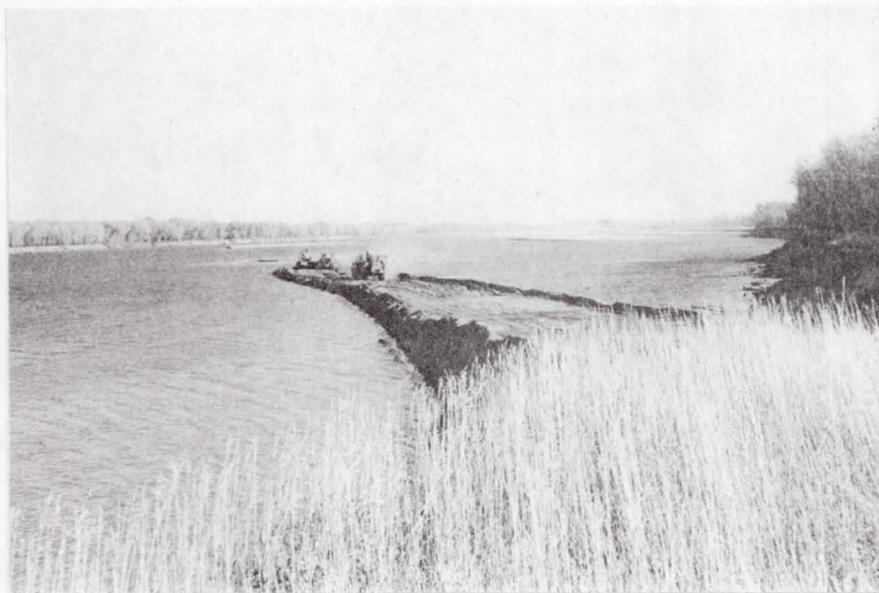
Construction View of Earth Core Dike 1345.5 loading downstream (Photo taken 4 October 1979)
